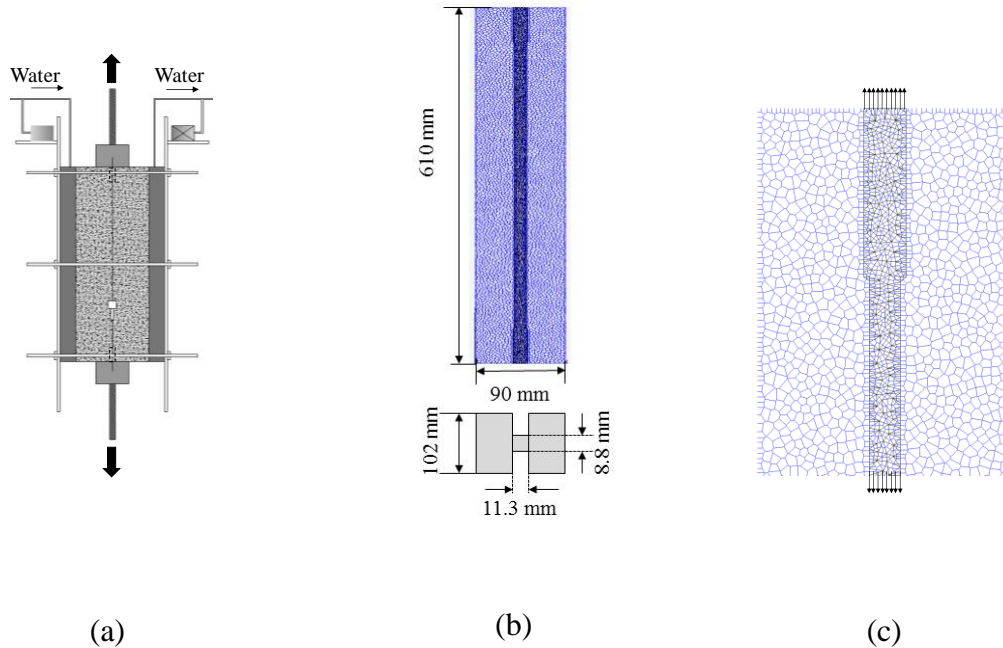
a) Sketch of the experimental test set-up, b) Equivalent 2D plain stress representation of steel rebar in the concrete; c) detail of the anchorage zone.
